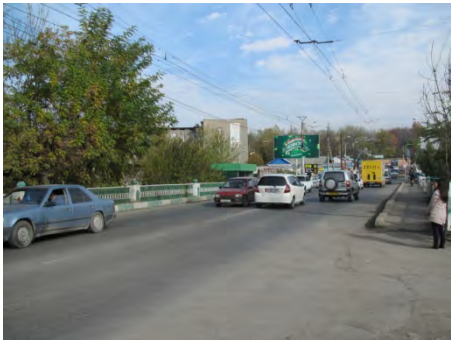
Photos of the Bridge on Abdukadirov St. (1/2)
